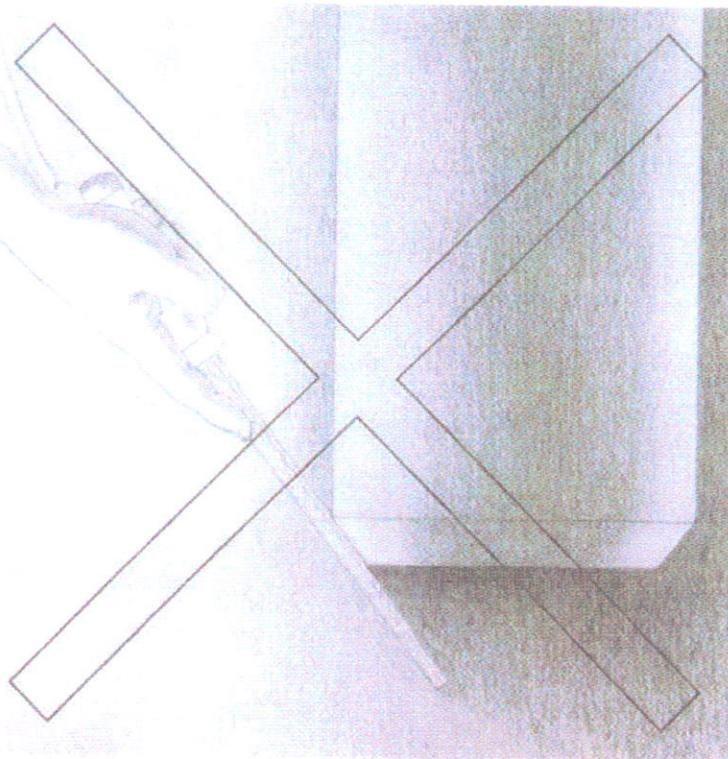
Rasps should not be used on asbestos-cement pipe
